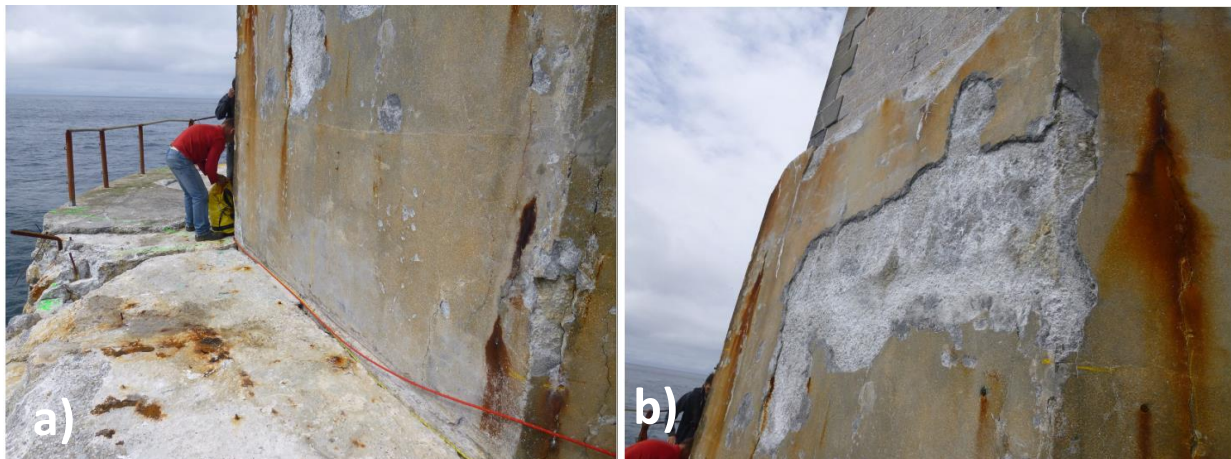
Damages of the concrete ring: a) Visible rust, b) Concrete delamination [32]
